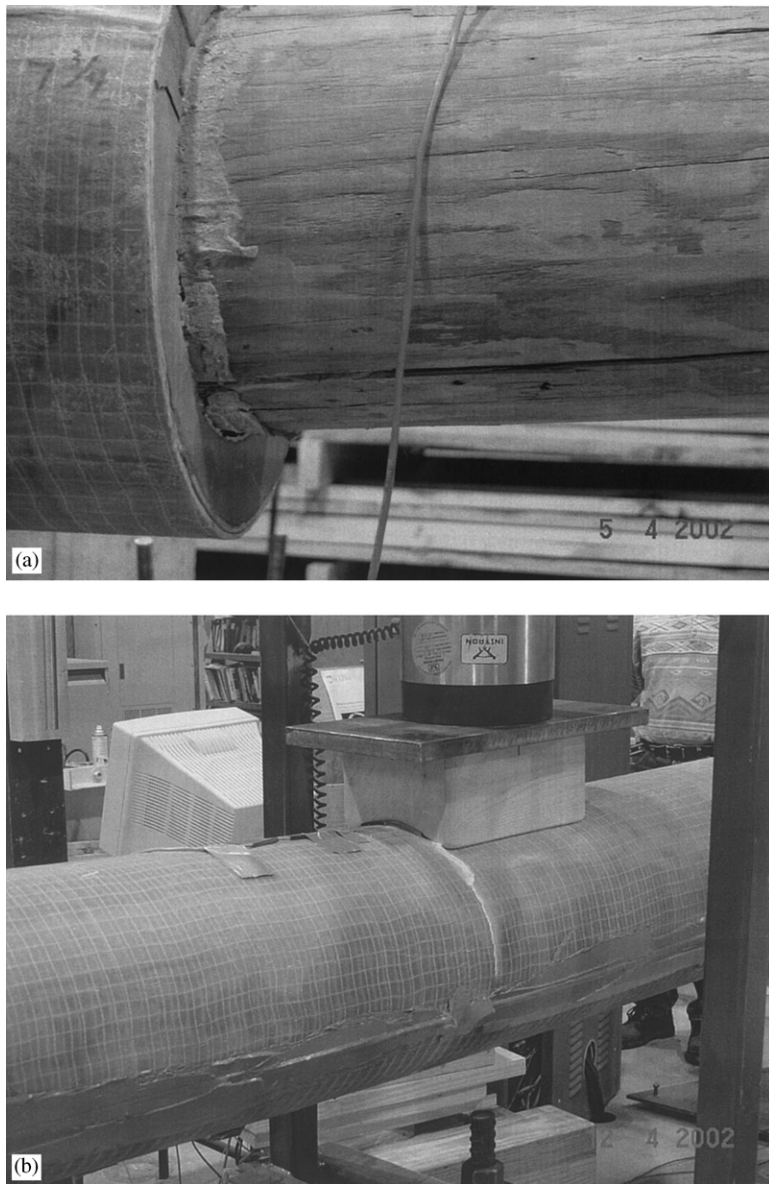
Failure modes: (a) Tension failure in wood pile at shield end (repair system B); (b) Compression failure in FRP composite shield (repair system C).
